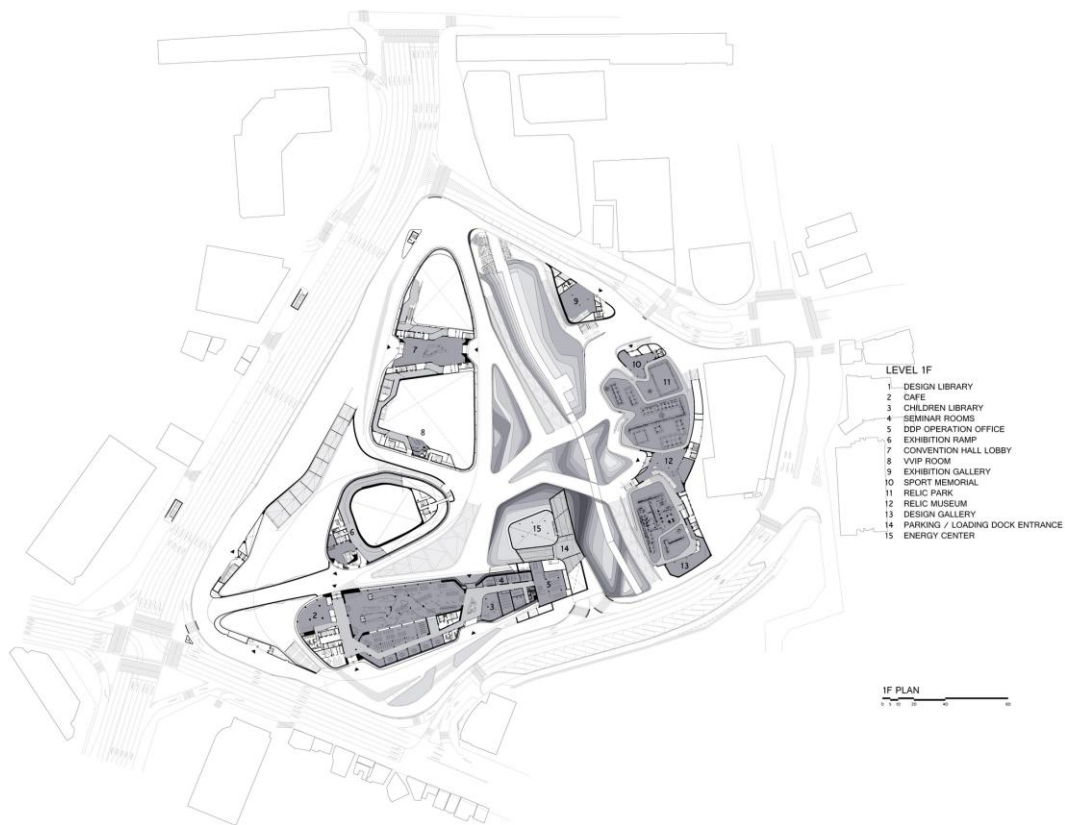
Dongdaemun Design Plaza level 1st floor plan.¹³⁰
